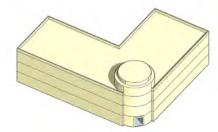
Basic massing, articulation, and opening strategies should relate to each other and break down the scale of the buildings.
